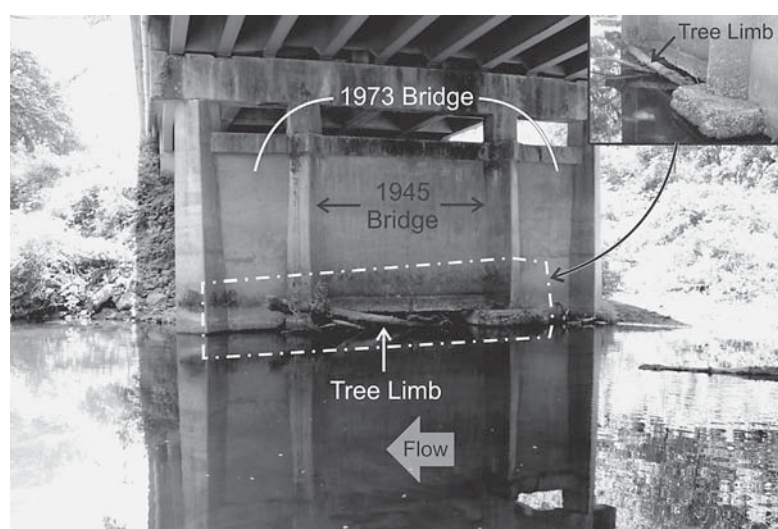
State Route 22 Bridge over Mill Creek. Original bridge built in 1945 was widened in 1973. Signs of rock scour were recognized and the 1973 foundations were deepened.
